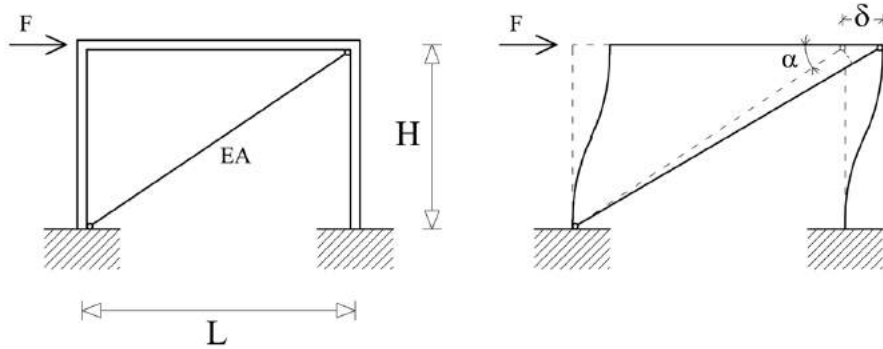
Scheme of a braced frame with a single diagonal element.
